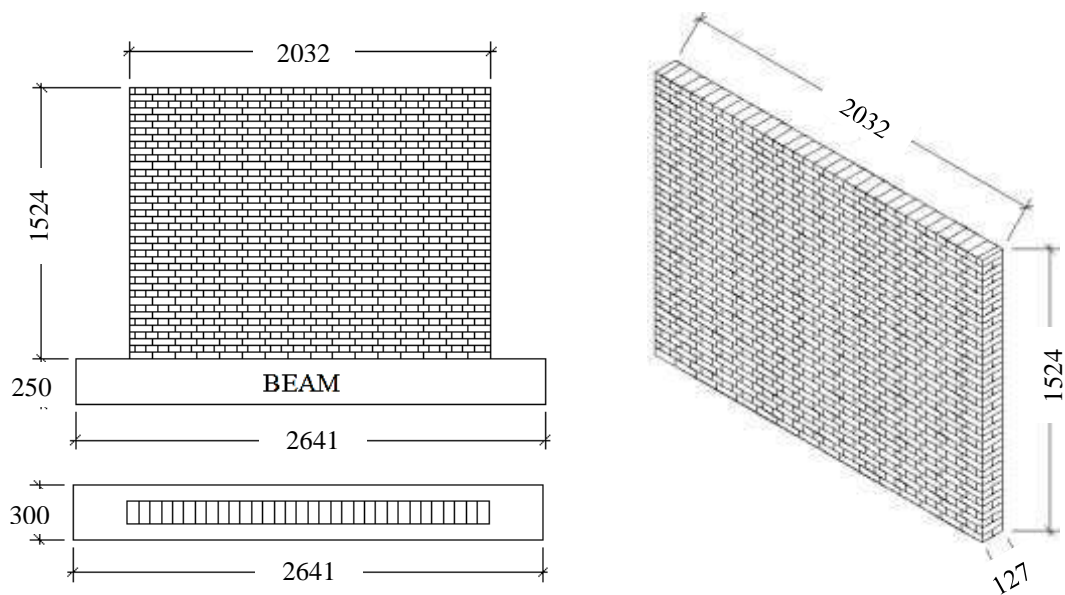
Detailed dimensions (in mm) of a typical wall sample (long wall)
